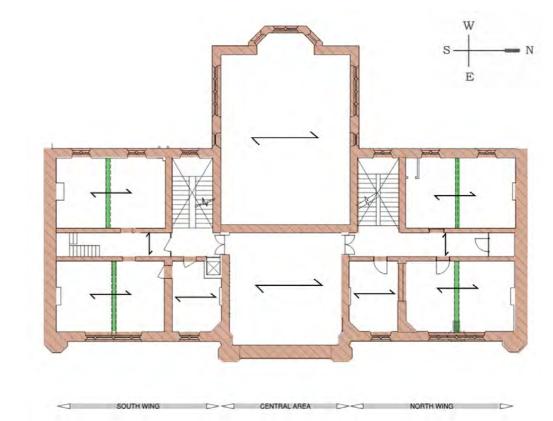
Typical floor plan, with loadbearing masonry walls shown in brown, and original locations of loadbearing timber stud walls shown in green. Arrows show direction of general floor span.
